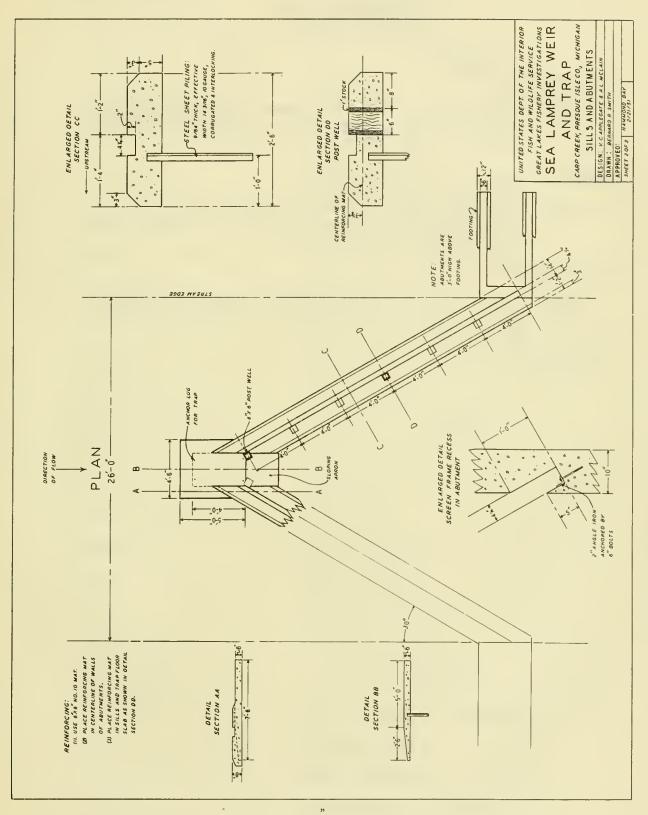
Diagrammatic plans of concrete sills, trap base, and abutments used to provide permanent base for portable-type sea-lamprey weir and trap.
